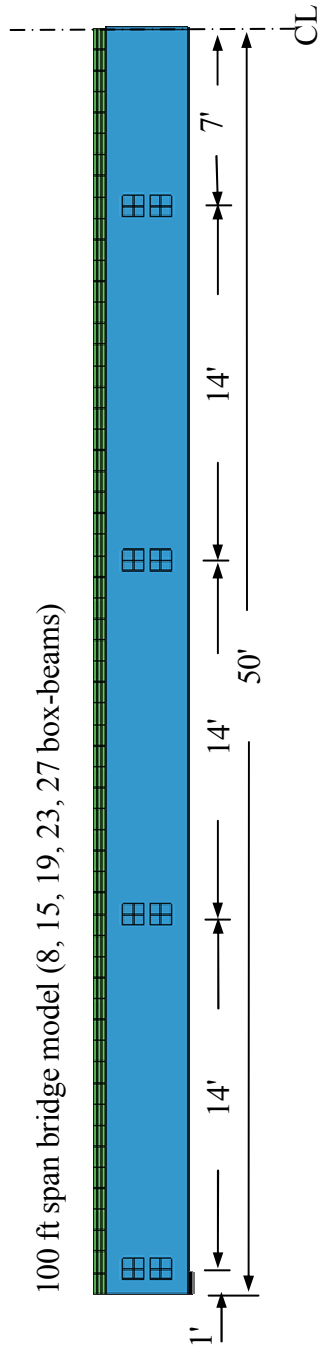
Bridge models generated using 36 in. wide box-beams (spans).
